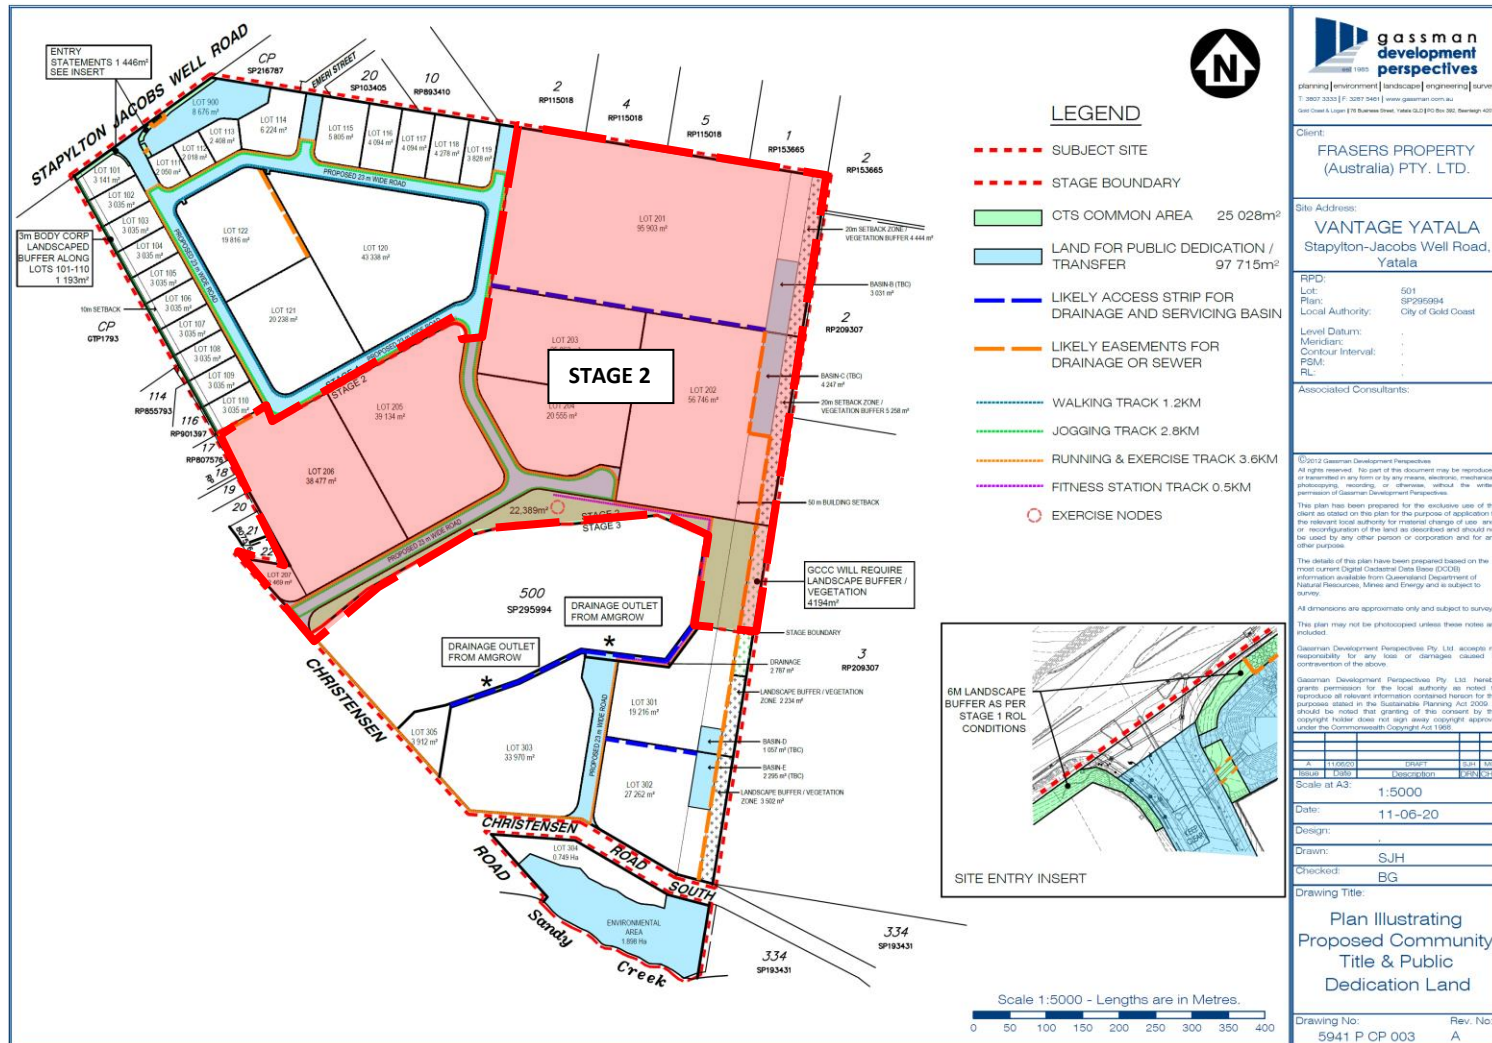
PROPOSED STAGE 2 LAYOUT
